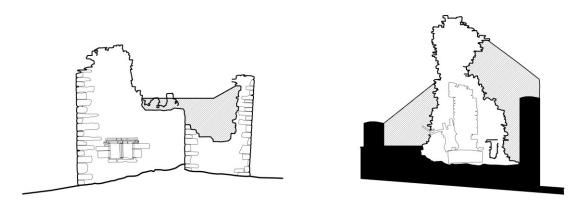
Survival of the north gable wall (left) and south elevation of the northern cross-wall in 2012 showing indicative areas of rebuilding in tone (Drawing prepared by Kevin Doonan Architect).
